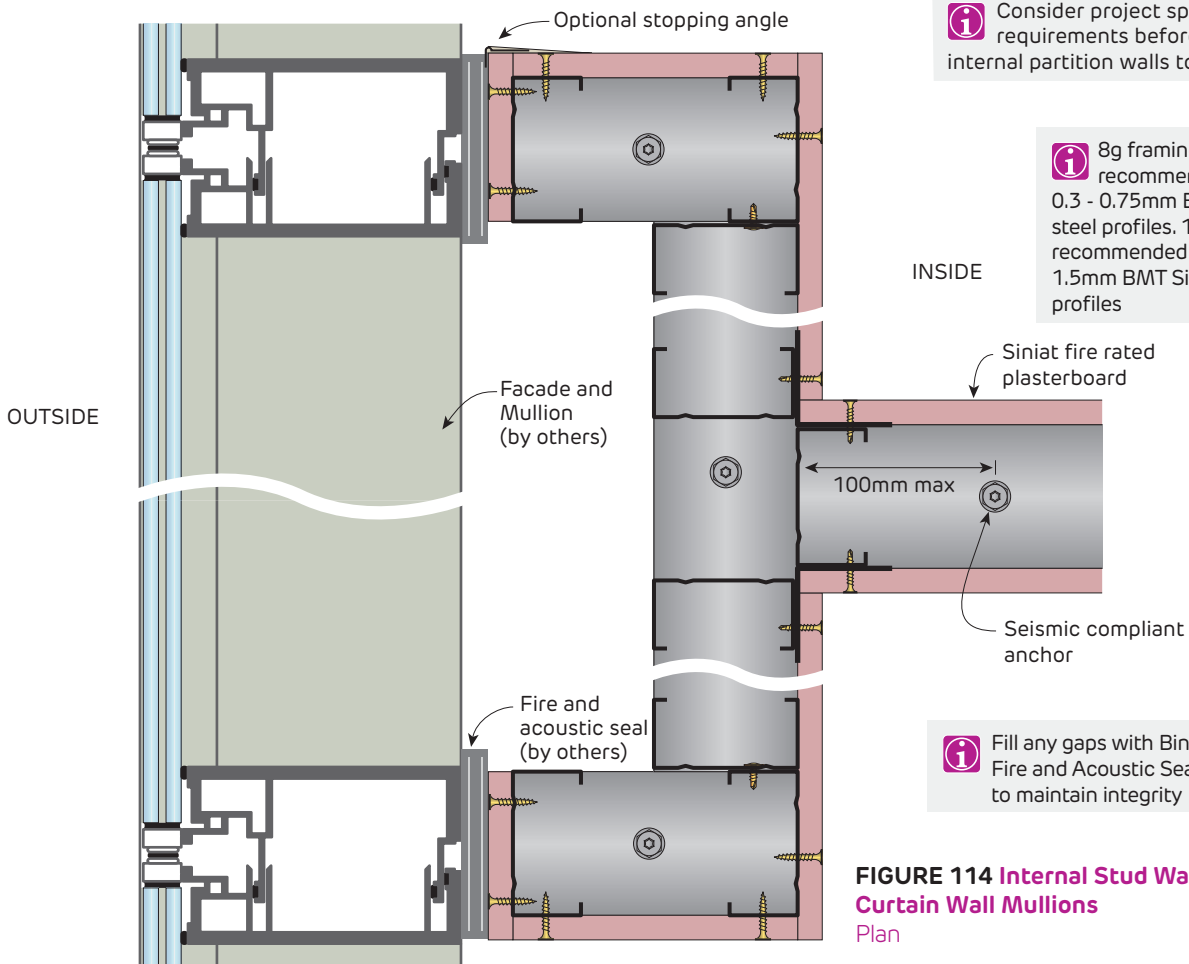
Internal Stud Wall to Curtain Wall Mullions
